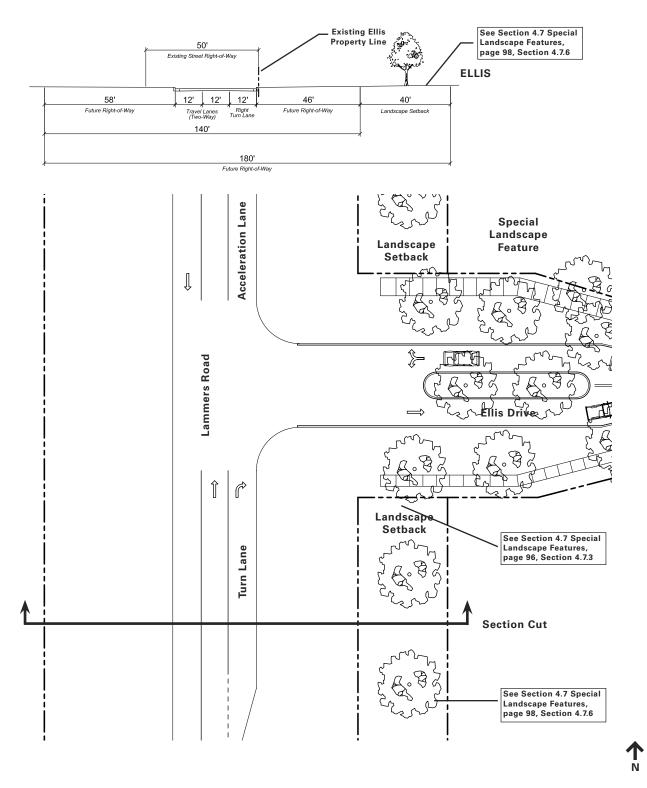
Existing Section and Plan: Regional Arterial – Lammers Road, Designation A (Cross-section at the time of connection of Ellis Drive to Lammers Road)
